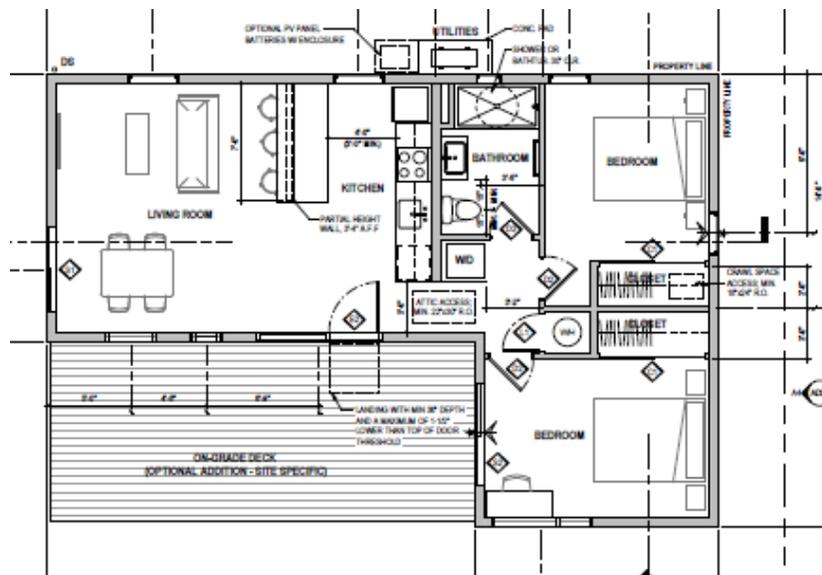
2-bedroom ADU Floor Plan (HEART GLADUR Plans Sheet AD11)
